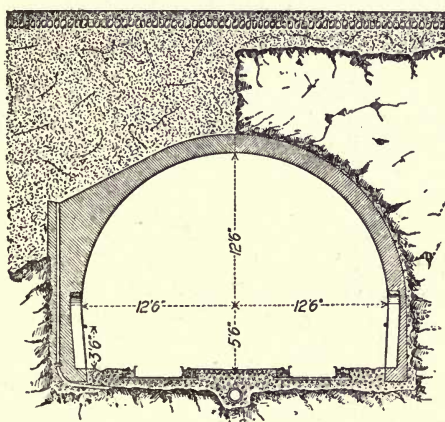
New York Subway: Standard Earth and Rock Sections.
